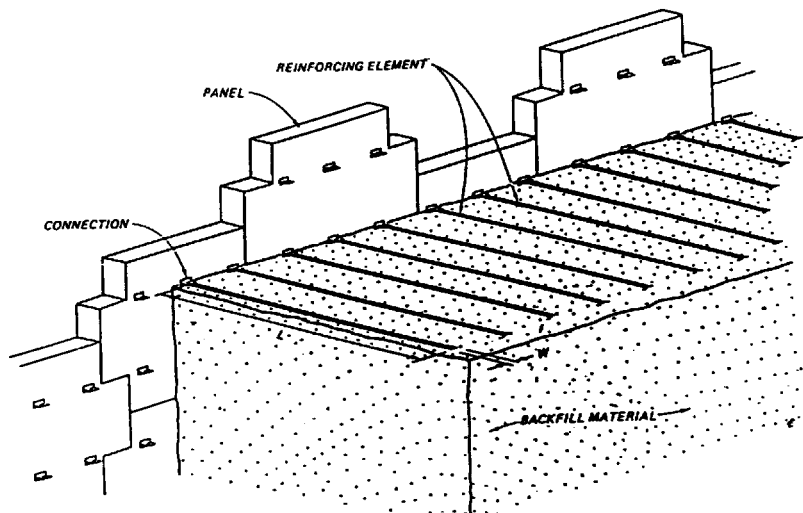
Diagram of reinforced earth retaining wall, a mechanically stabilized backfill system.
